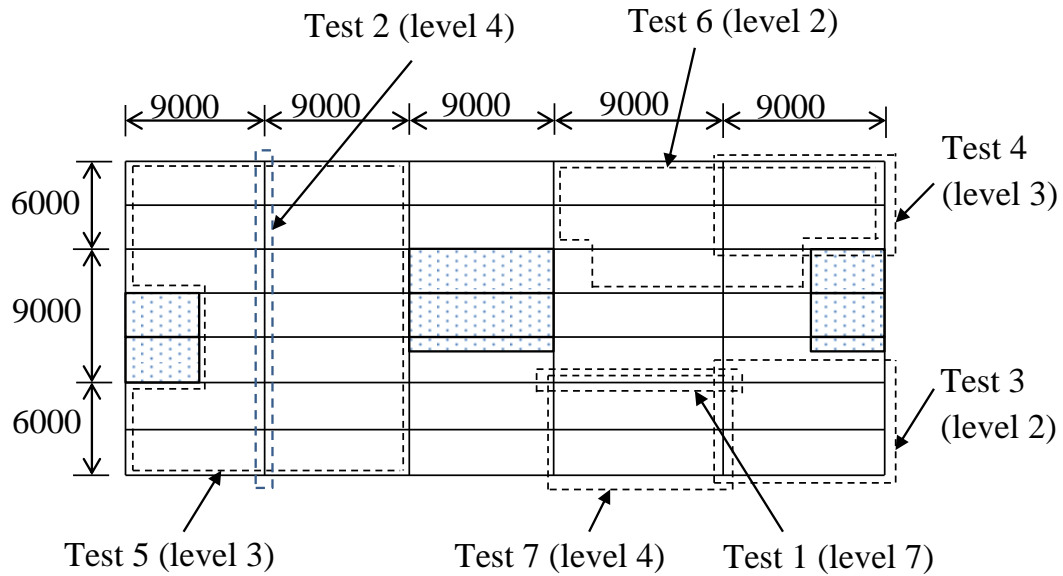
Floor plan and locations of the Cardington fire Tests
